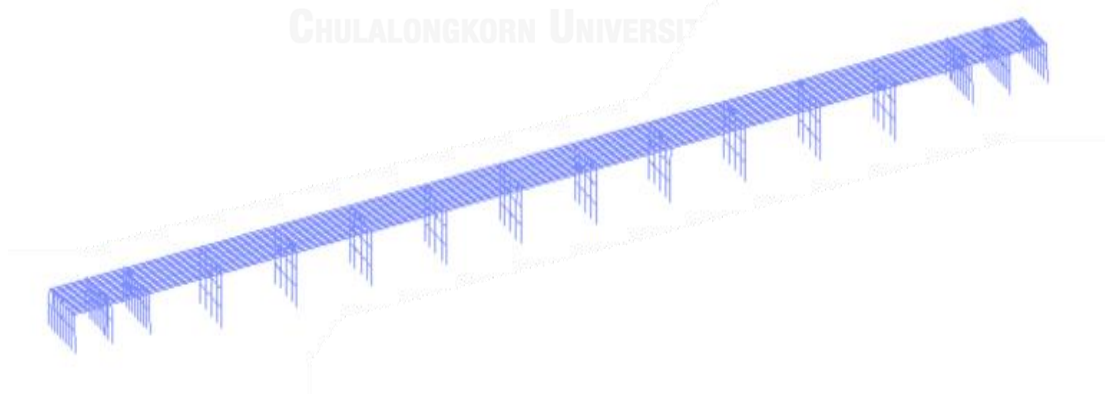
Structural model of MAE LAO Bridge in OpenSees
